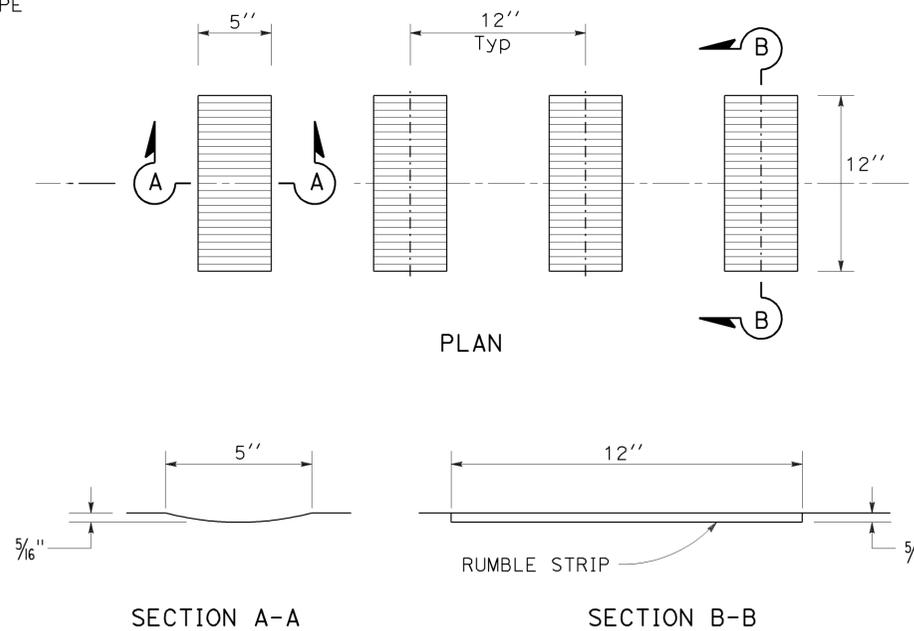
WITH CENTERLINE RUMBLE STRIP
